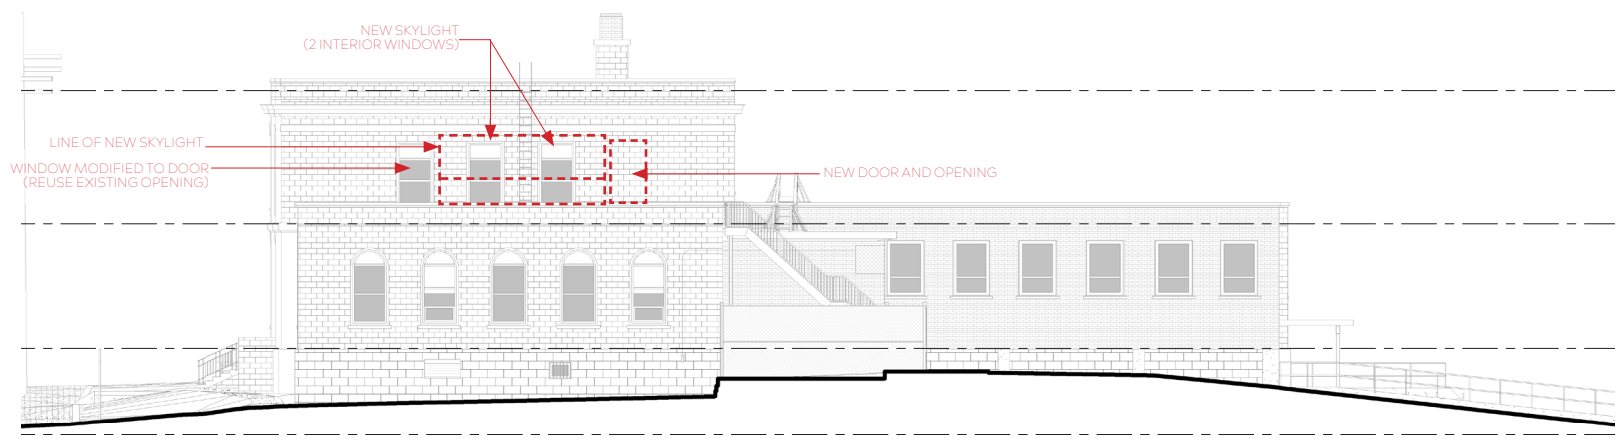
NEW DOORS (RESIDENTIAL ROOF ACCESS)
